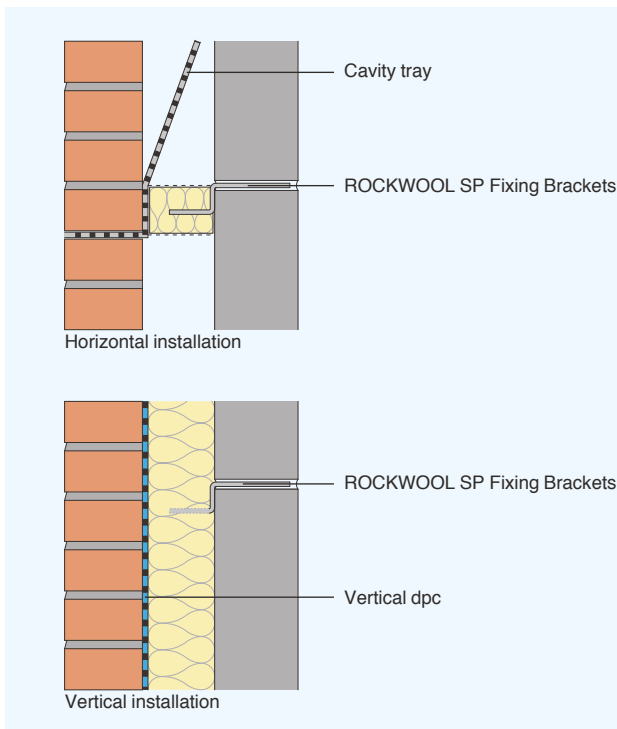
Figure E: ROCKWOOL SP Firestop Slab between masonry leaves
